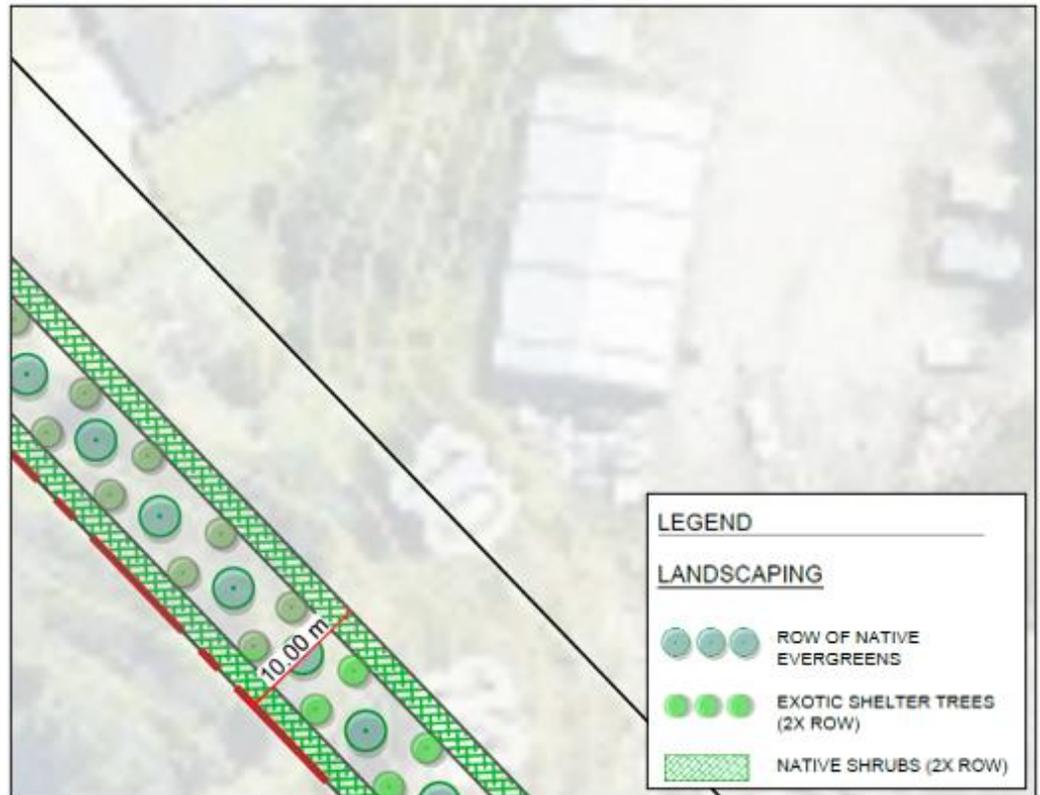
Zoomed-in excerpt of MPAD Drawing ‘Landscape Plan – Permitted Works – Boundary Landscaping’, showing the 5x rows of planting to perimeter locations, with legend inset. This detail of landscaping was prepared by the applicant’s landscape architect and confirmed consistent with the landscaping requirement of Te Puna Business Park Structure Plan so as to satisfy Rule 12.4.16.3.b.
